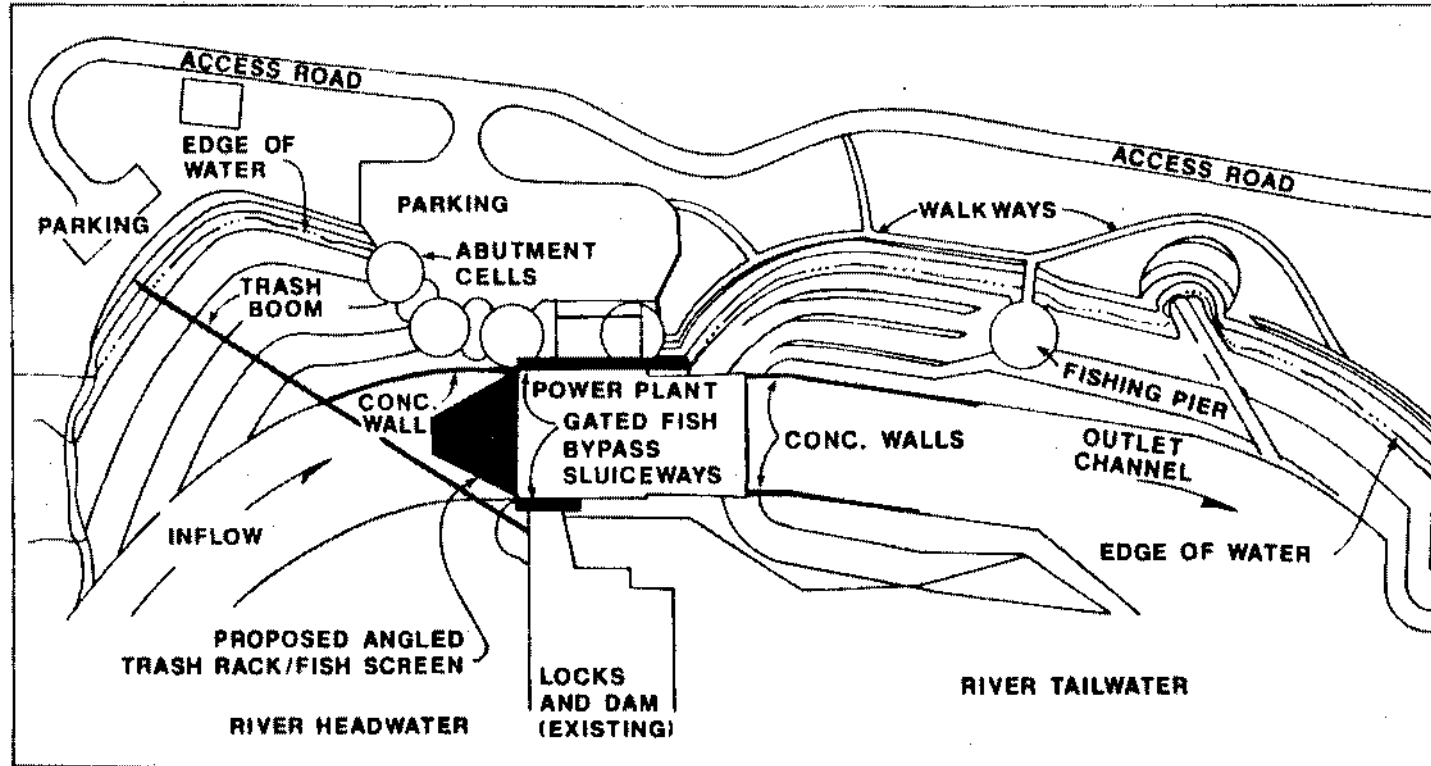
Conceptual plan for installation of angled fish screen, trash rack, and fish bypass system at a hydroelectric power plant on the upper Ohio River system. Adapted from transmittal by B. Rizzo, USFWS, to W. Perry, FERC, July 1, 1987.
